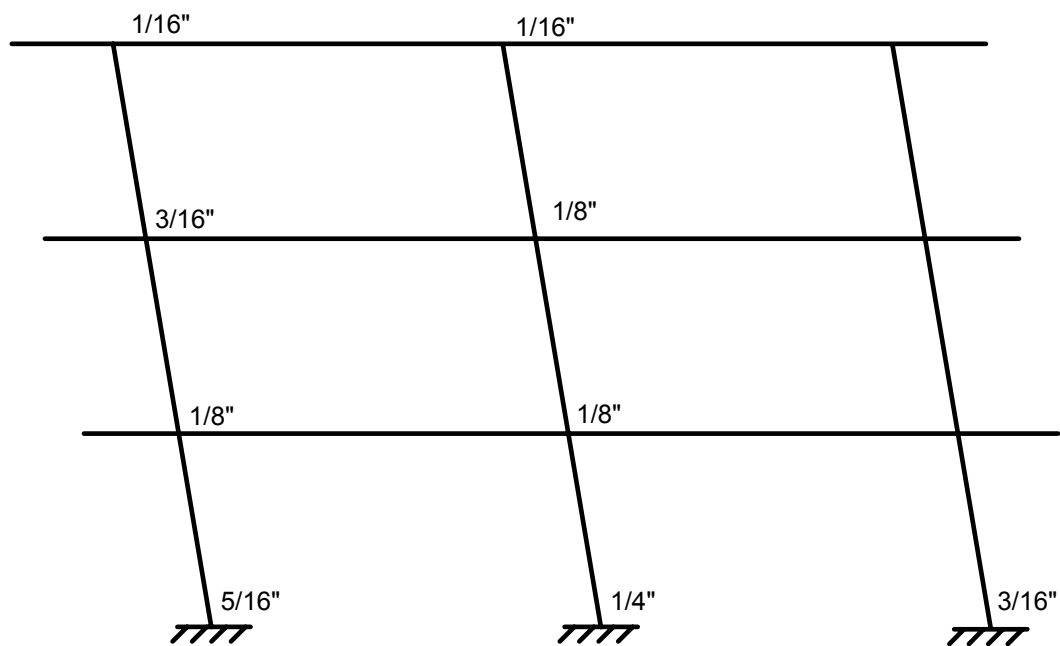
Flexural Crack Widths Frame B, South 3% Roof Drift
